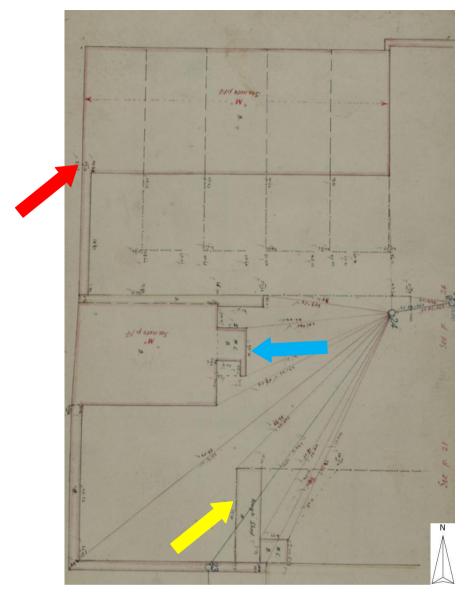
Metropolitan Water Board plan showing the tenement block (marked with a red arrow), the former stables at the rear of 757 George Street (marked with a blue arrow) and a wooden shed (marked with a yellow arrow) (FB1088).
